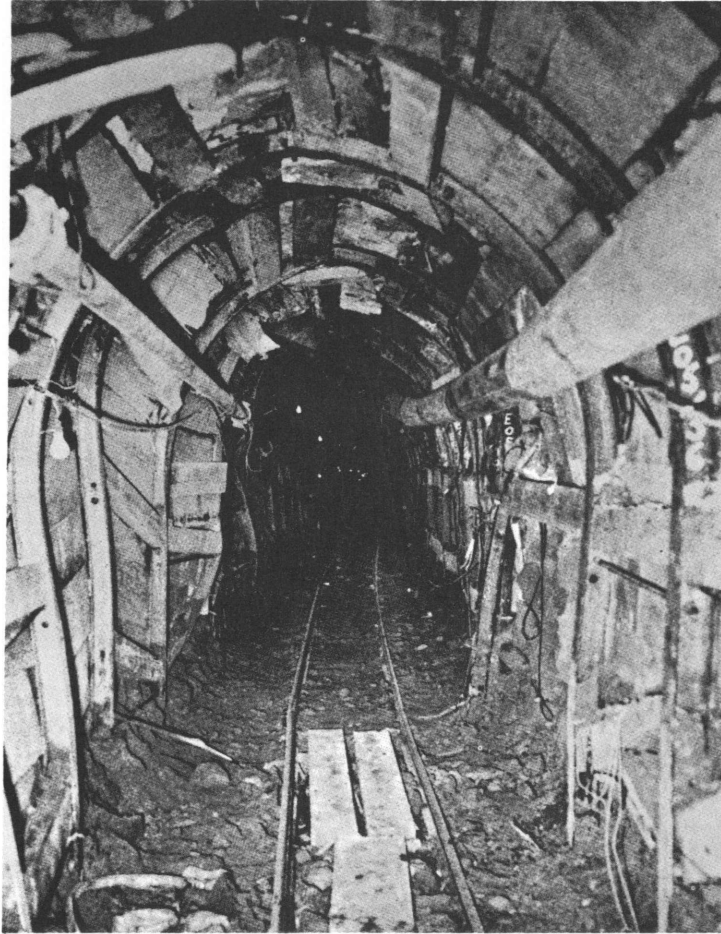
Typical damaged section, drift U12e.05, Logan event.
